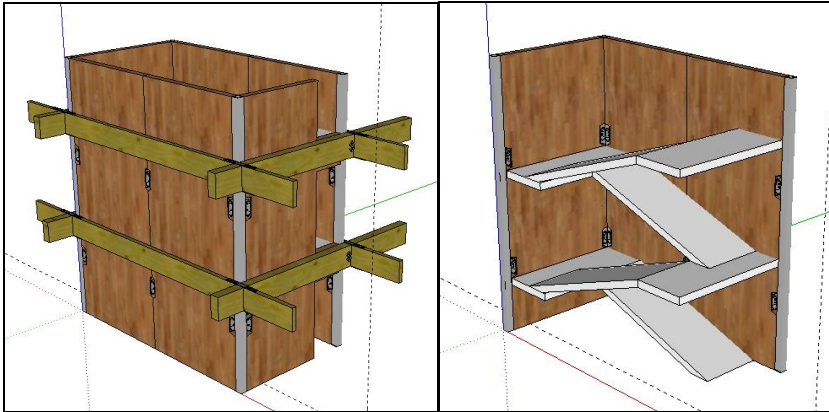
High Seismicity option (Specimen 1), showing the stair and landings. Post-tensioned CLT rocking walls with UFP devices and steel corner columns, tested at 1/2 scale
